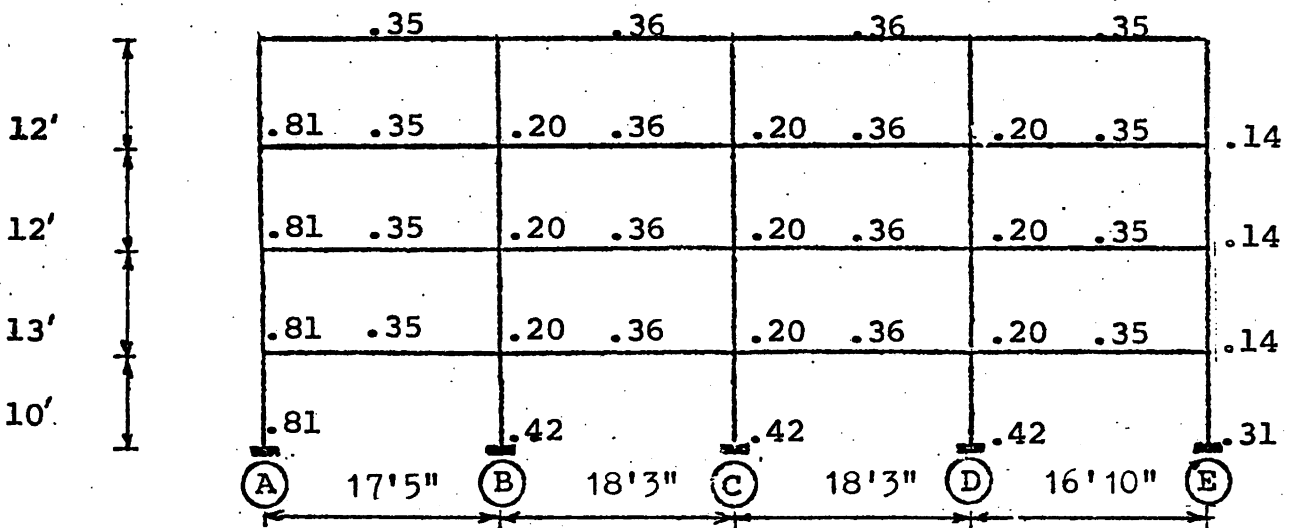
Selected Frame in Building 1 with Moments of Inertia for Beams and Columns, (ft^4)
